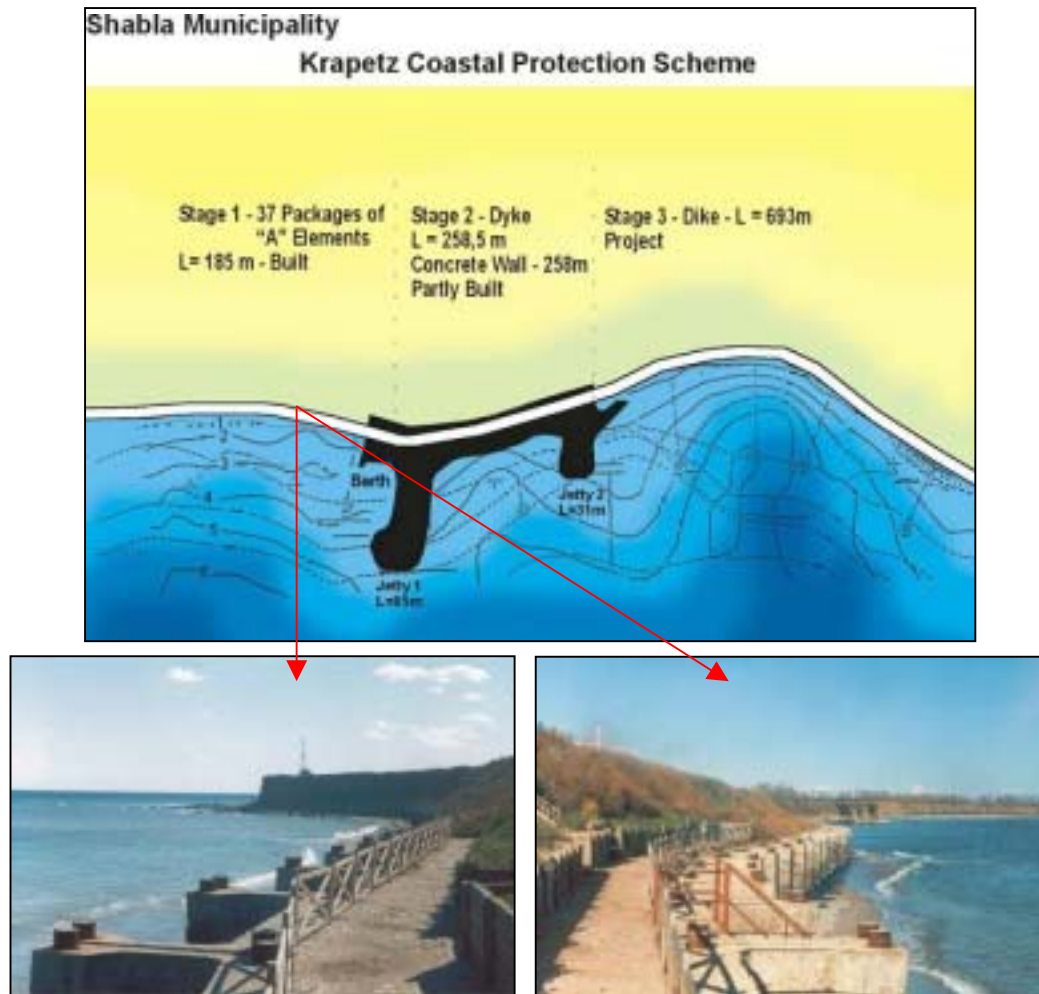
Cape Krapetz Coastal Protection Scheme and structure of the protection facilities.
